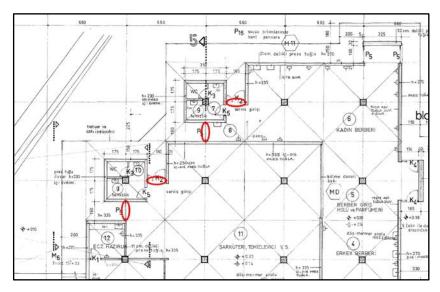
Joineries located inside on Block B Source: METU Directorate of Construction & Technical Works
